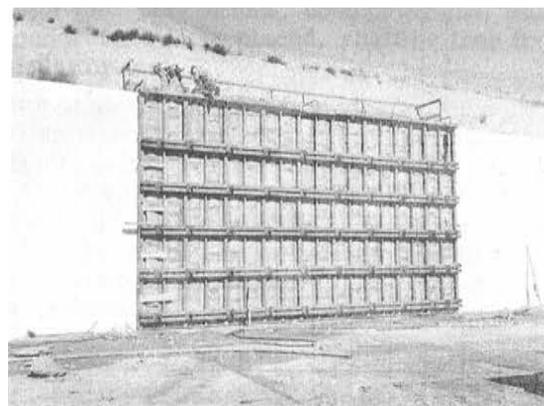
Rock wool insulation bats fastened to outside of form sheathing with battens along edges. These forms were used to construct nine wall panels.
